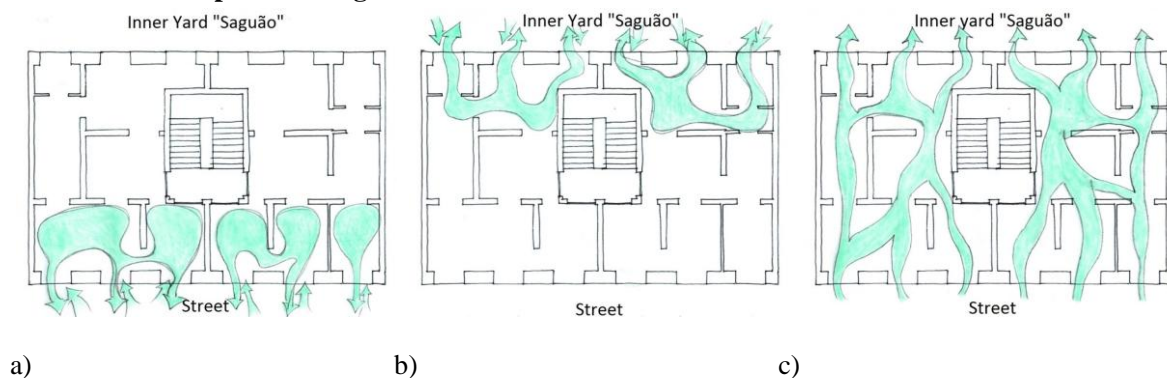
(a) Scheme Plan of single-side ventilation that occurs with the windows open in the street façades and (b) scheme of single-side ventilation that occurs with the windows open in the inner yard (“saguão”) façades and (c) scheme of cross ventilation that occurs with open windows in the street and inner yard (“saguão”) façades (source: author).
